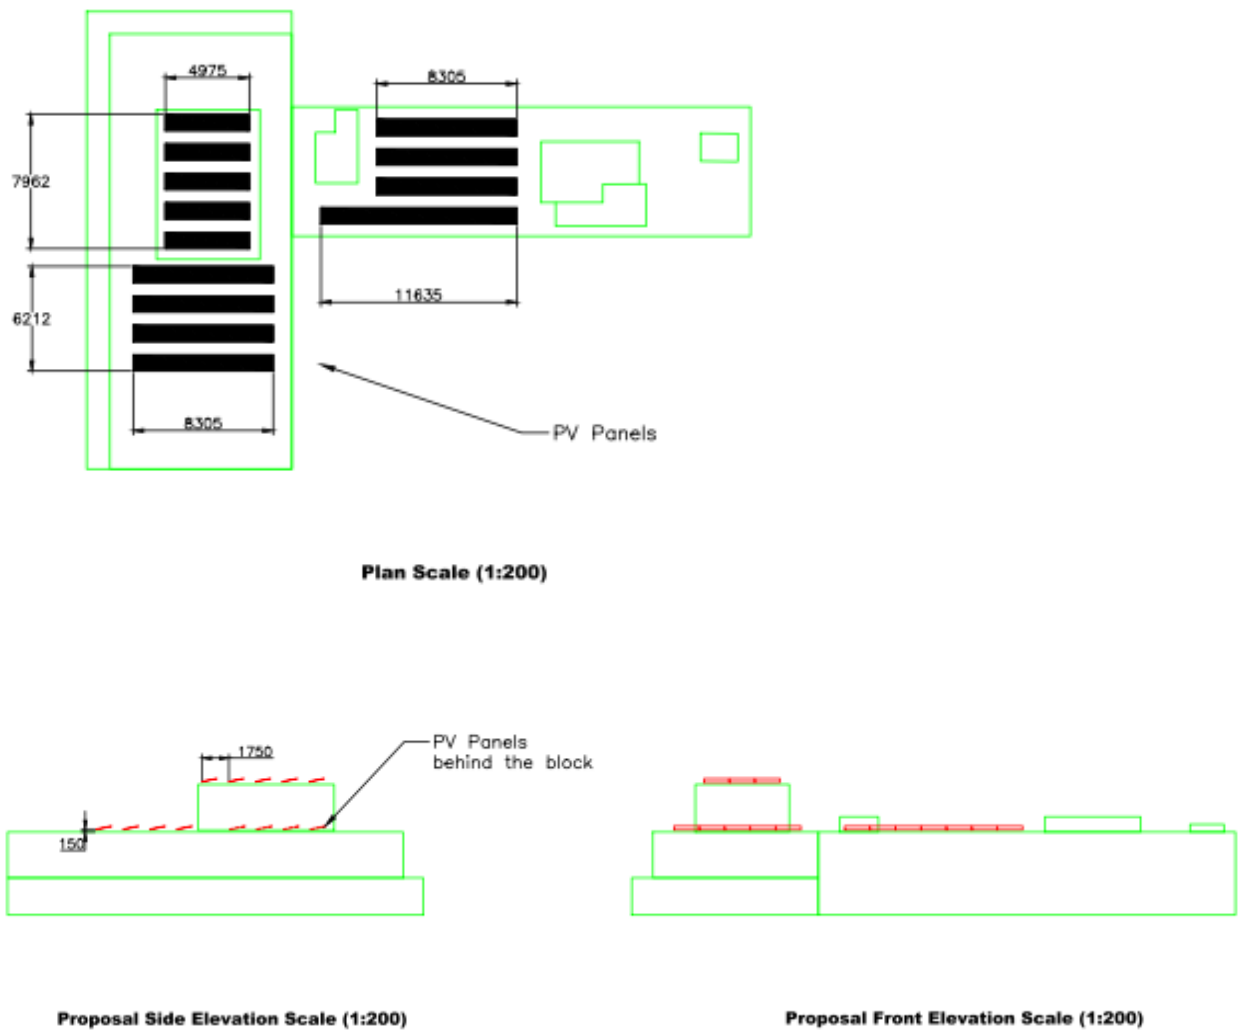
CAD plan showing panel locations on Carr Saunders Hall
